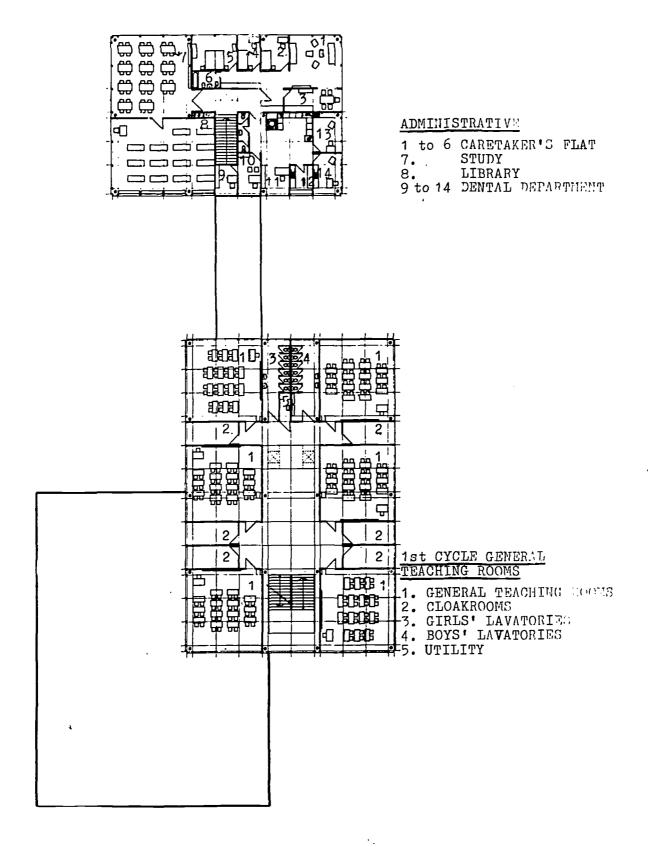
"Collège secondaire de Beausobre" - upper floors
